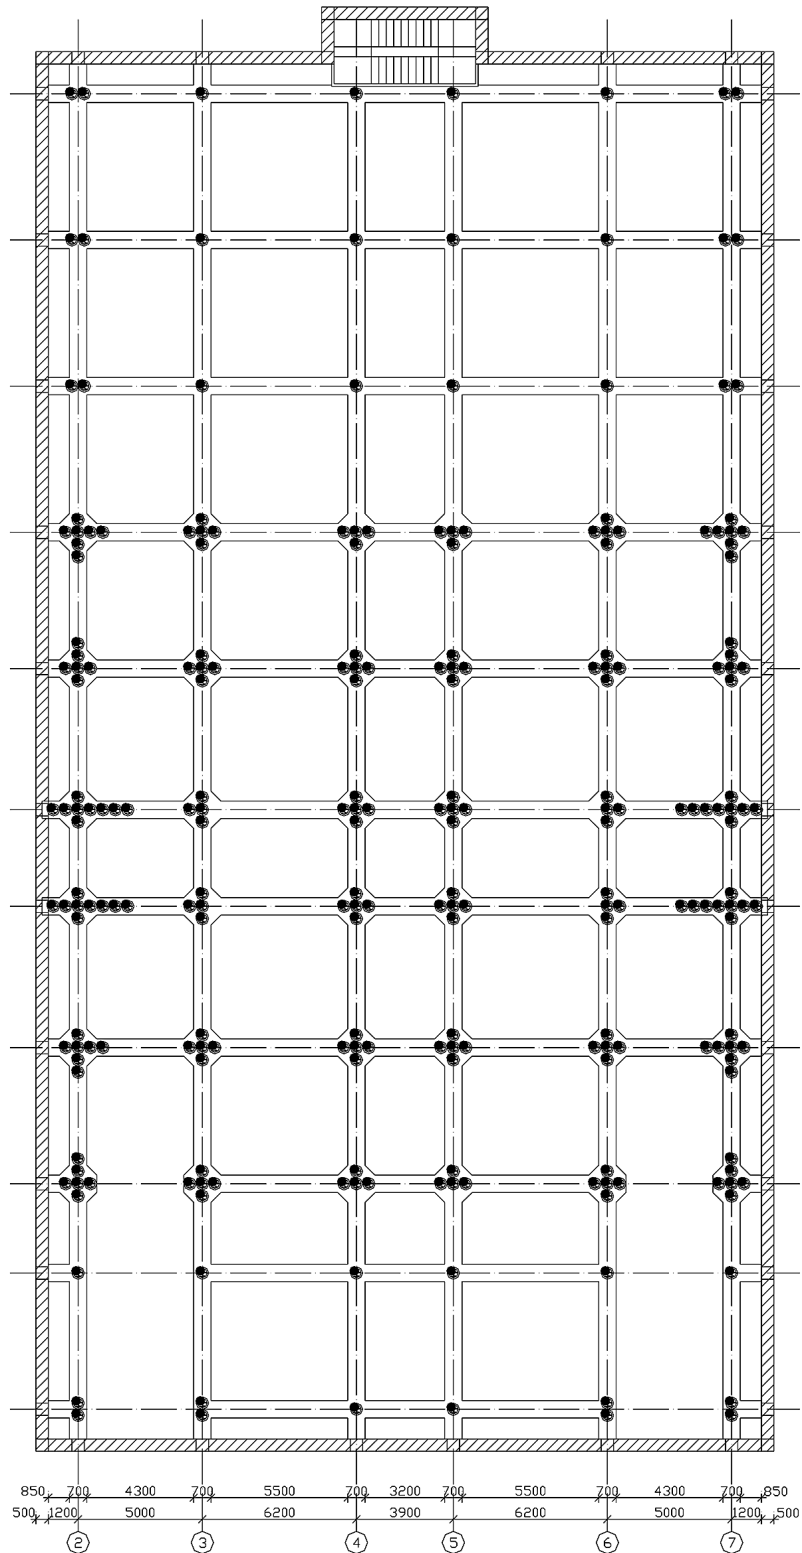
The preceding version of the isolators' location plan in "Arami" building
